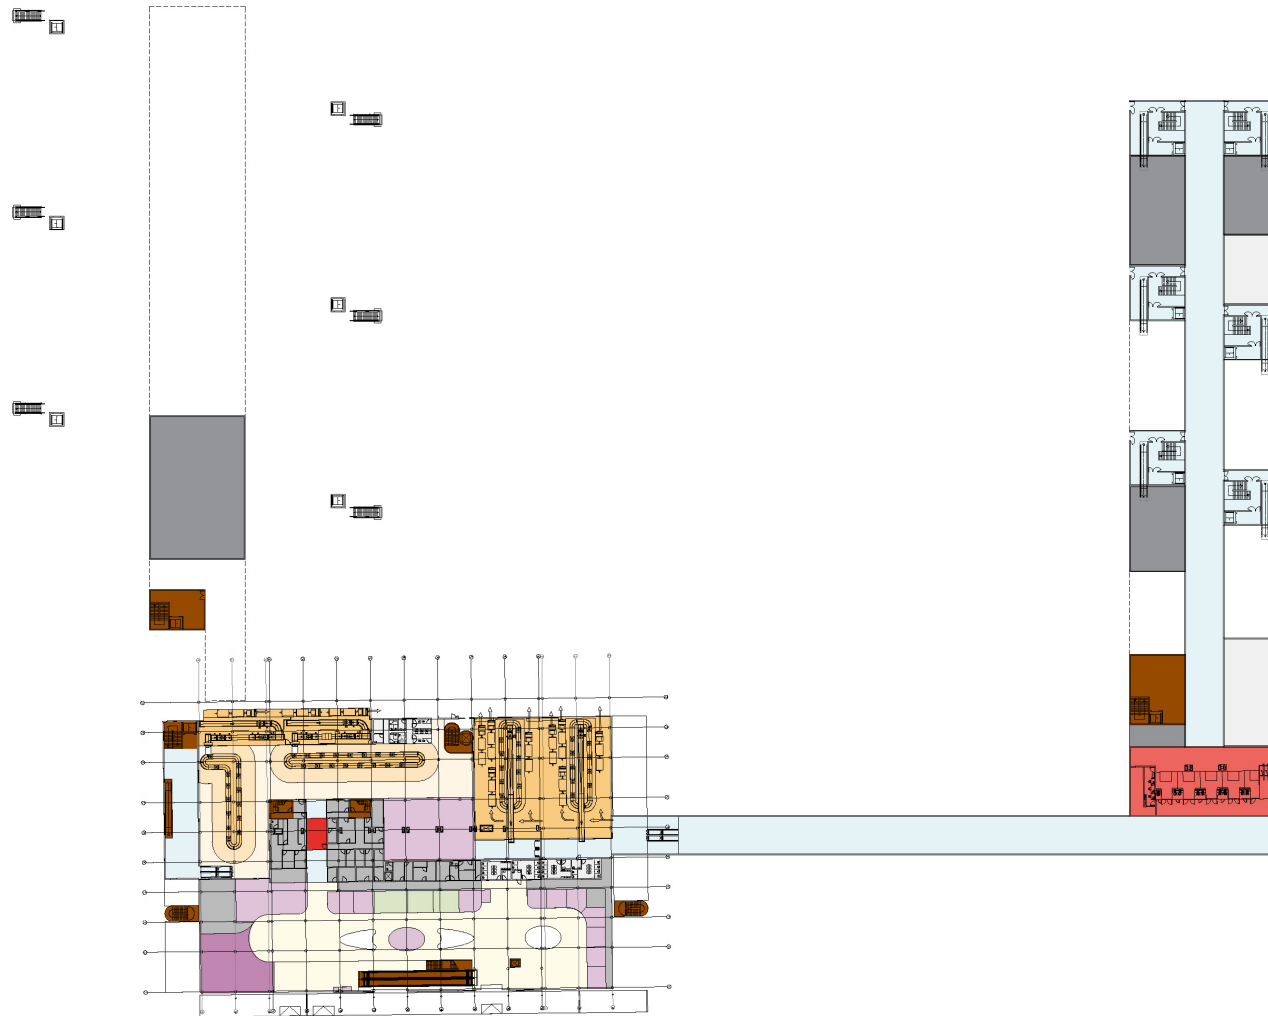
PROPOSED FUNCTIONAL LAYOUT LEVEL 1 (GROUND FLOOR)
